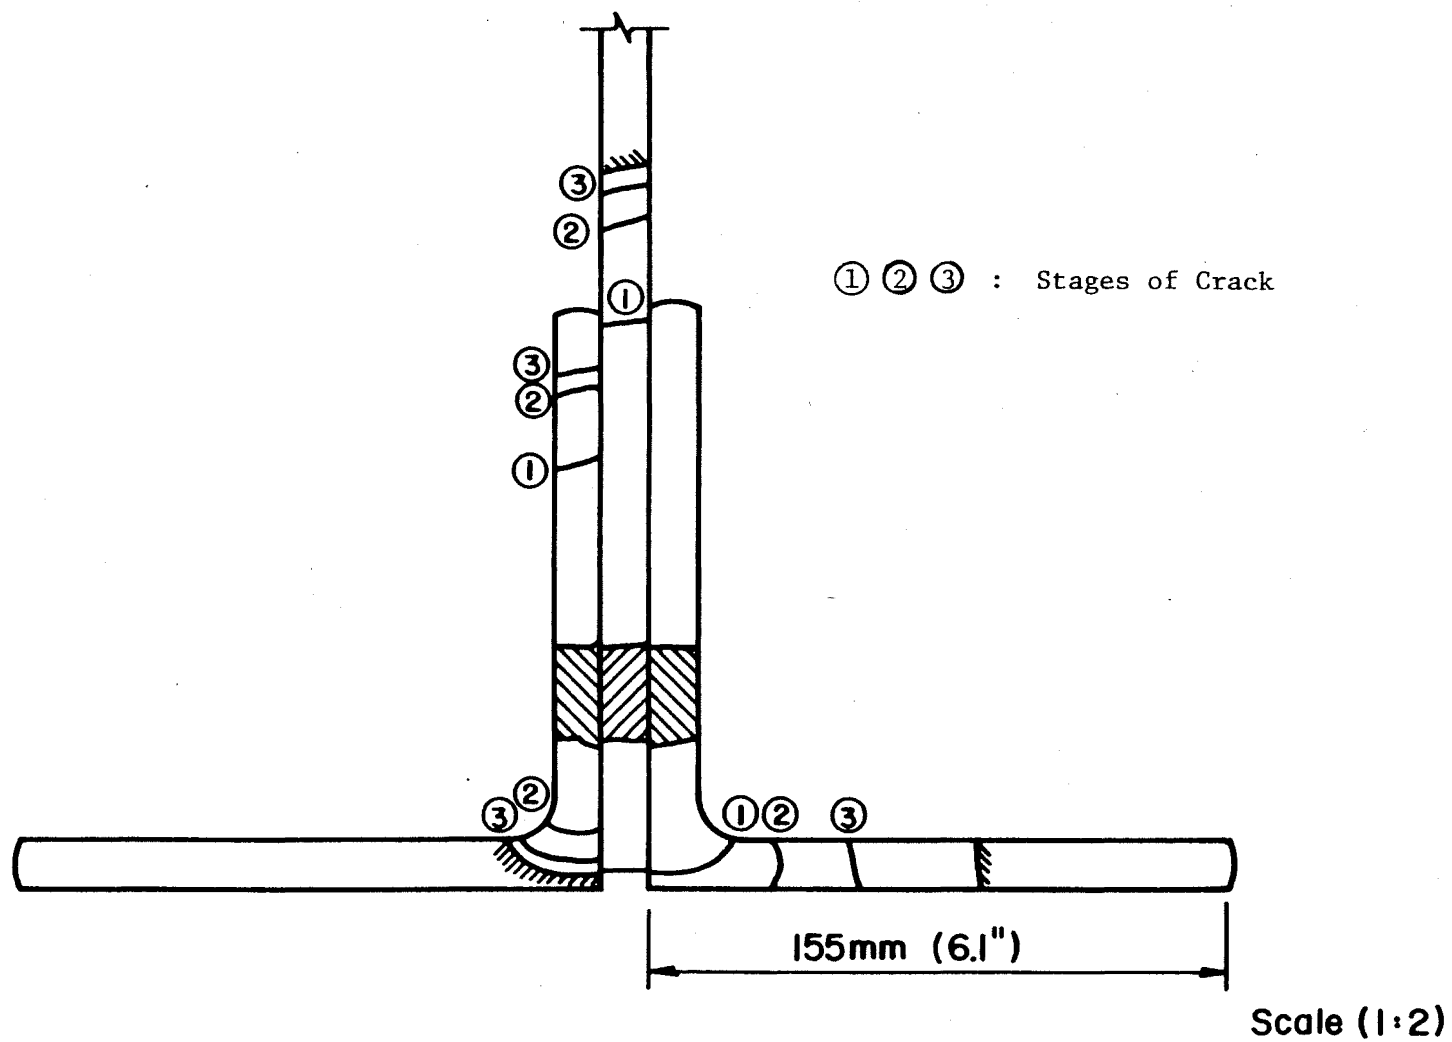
Schematic of Beach-Marked Crack Fronts in Test Beam
